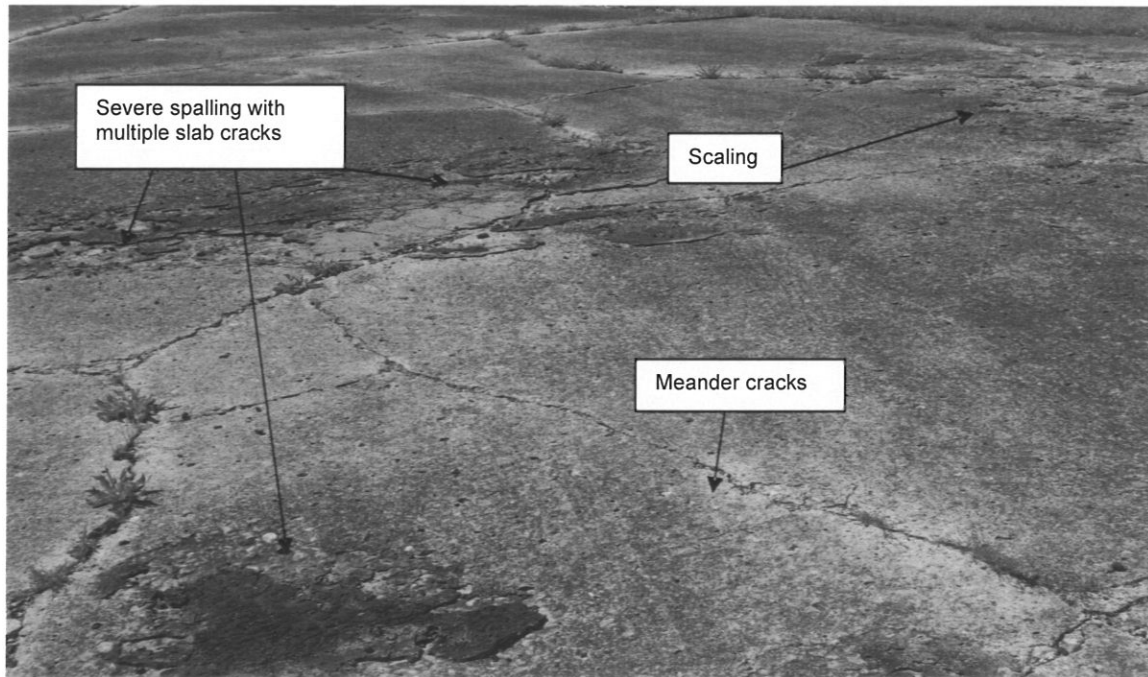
Runway 35 Joint Cracks With Vegetation
